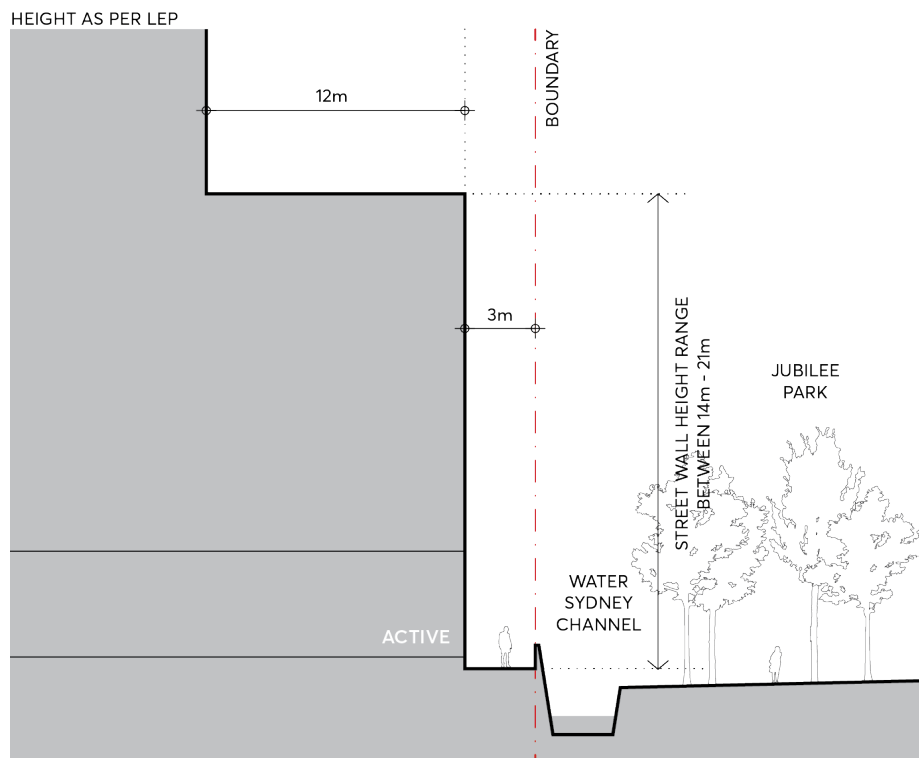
Jubilee Park Edge (Section F) Setbacks and Street Wall Height
